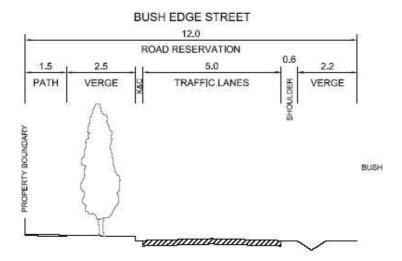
(e) Port Sorell and Environs Street Cross-section designs - Bush Edge Street
